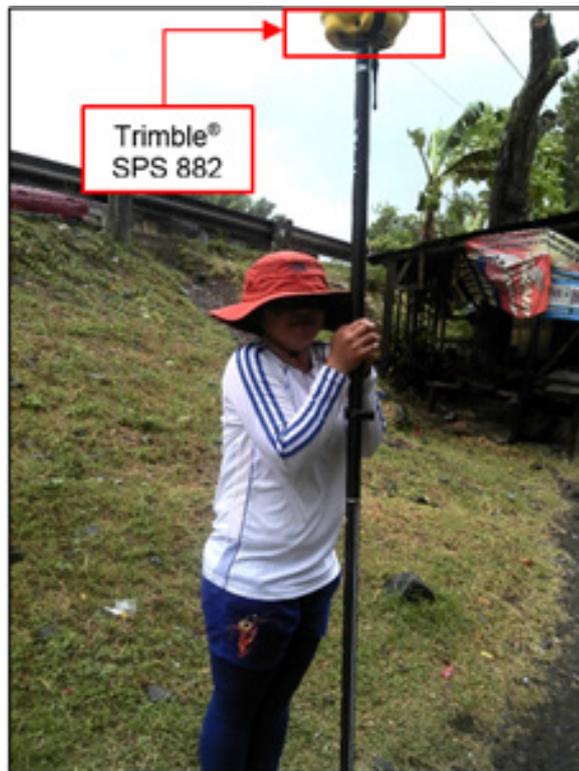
Cross-section and bridge as-built survey for Mambayaan Bridge.
